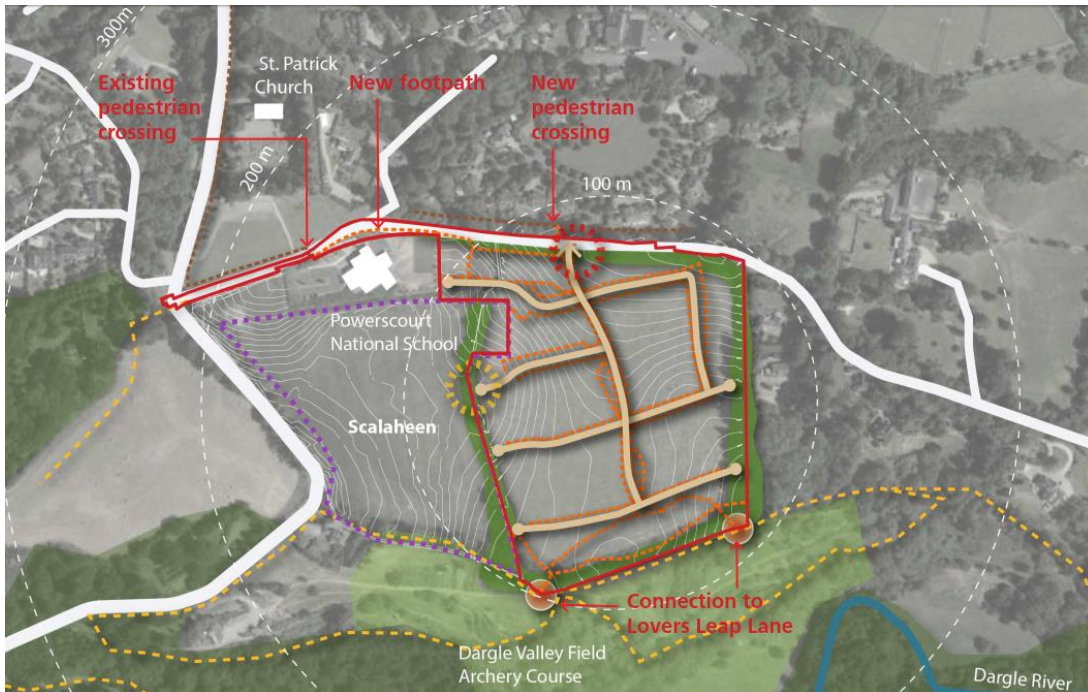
Extract from MOLA Architecture Design Statement showing new footpath to south of Cookstown Road, new pedestrian crossing to north of Cookstown Road and connections to Lovers Leap Lane to the south the development.
